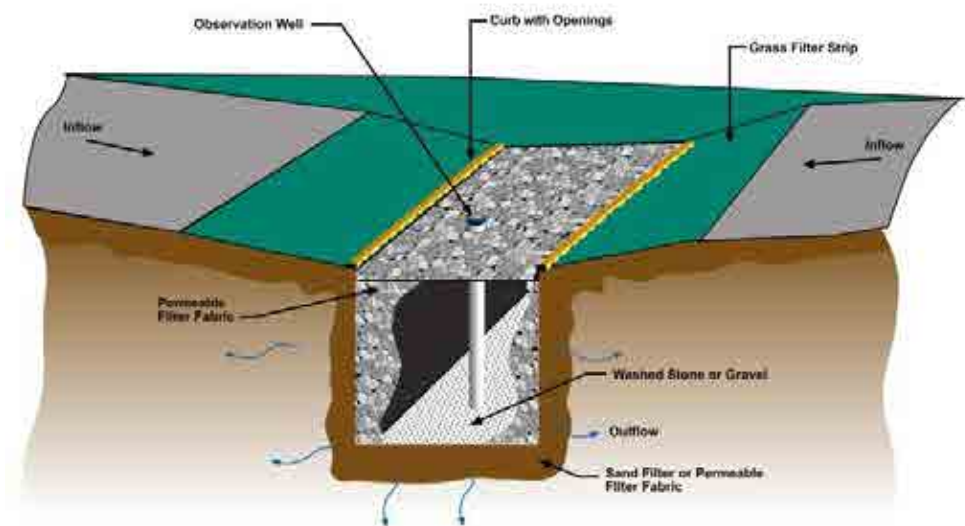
Infiltration trench. Plan made by Rodrigo Proença de Oliveira
